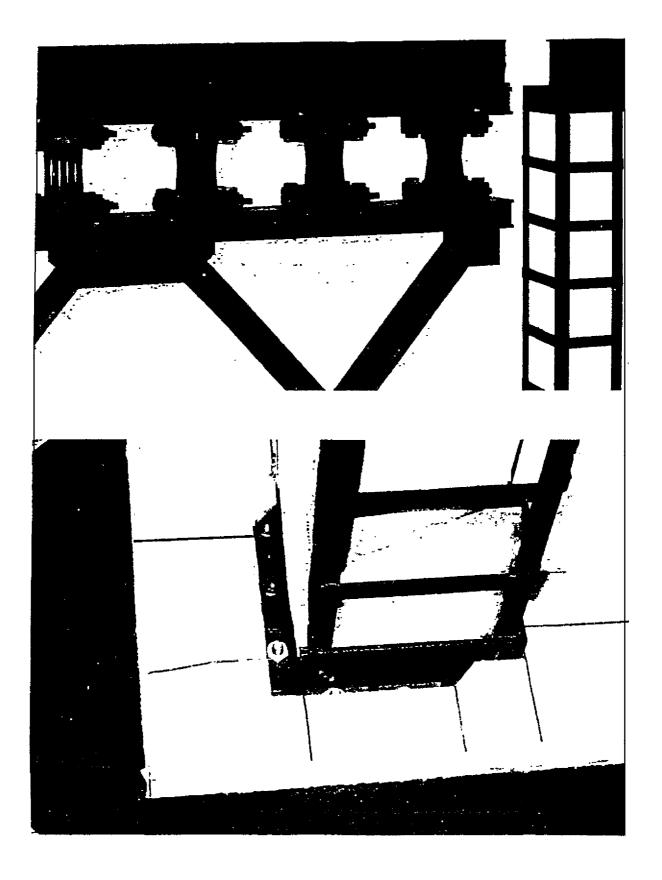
Typical Connection Detail and Column Jacketing for a Multiple ADAS Frame
